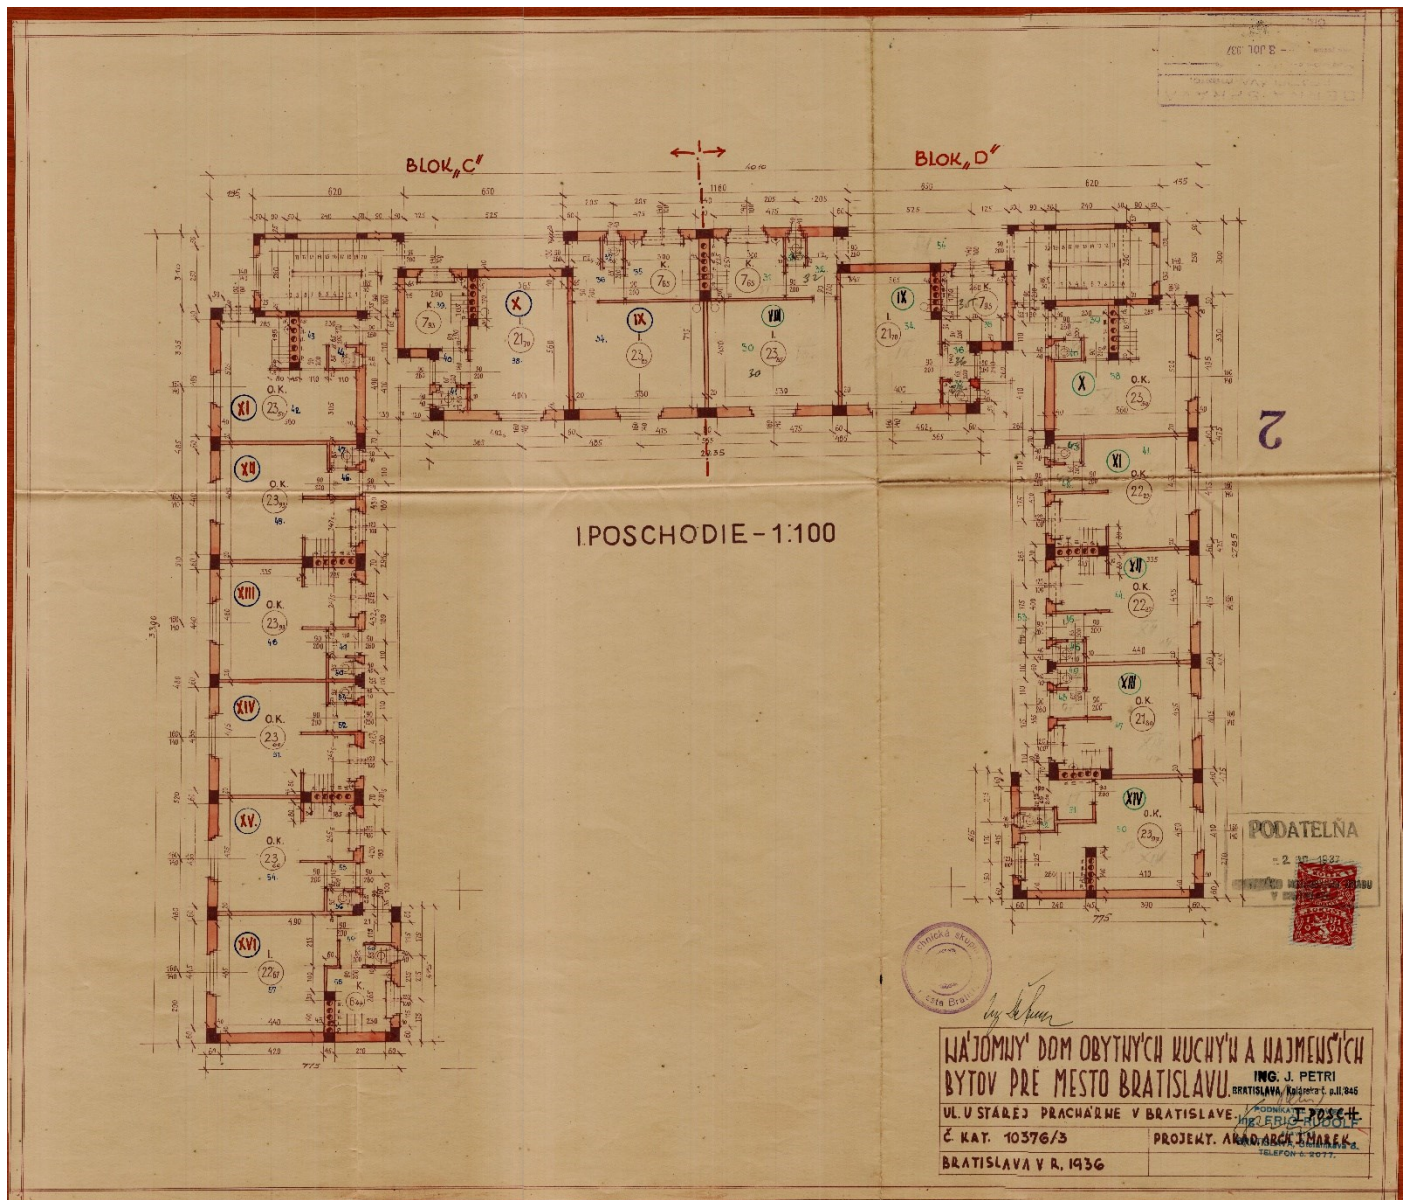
City rental house with habitable kitchens and the smallest-size flats in Športová Street, Bratislava - 1st-floor plan. (Source: State Archives in Bratislava, fund "Daňová správa Bratislava", box 68, 1936)
